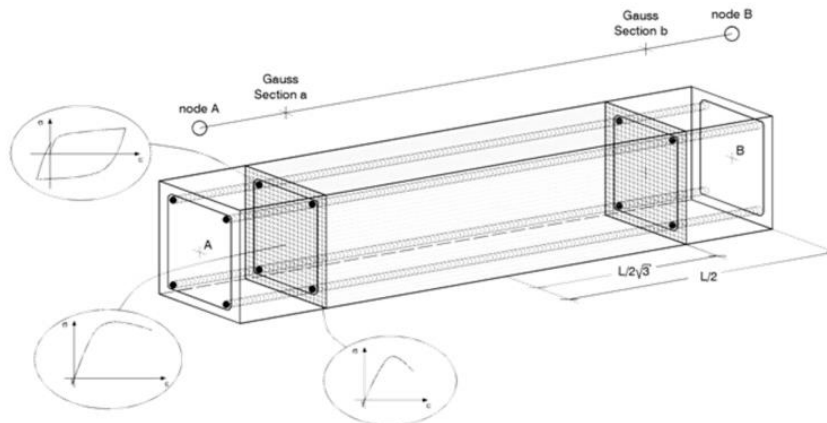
Diagram of the fibre modeling of a reinforced concrete beam
